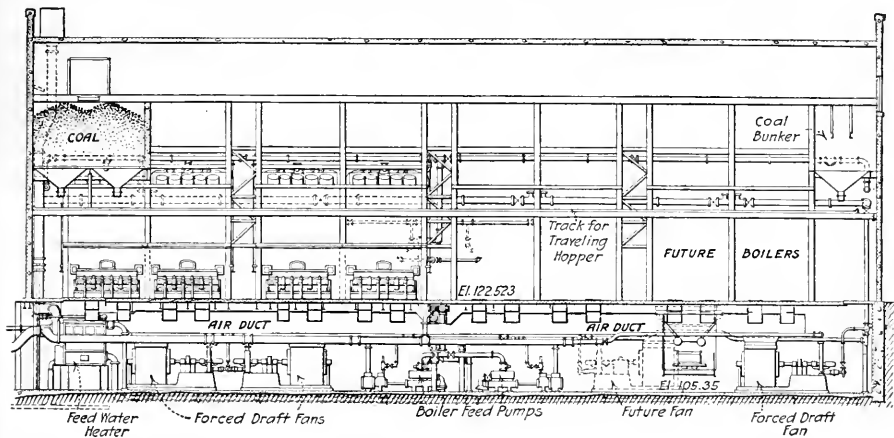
SIDE ELEVATION OF THE NEW BOILER ROOM
